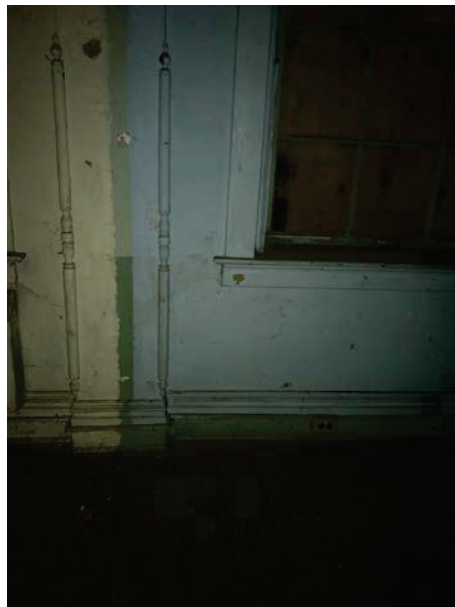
Blue, green, cream and white paint on the plaster walls in all the 2nd floor classrooms.
